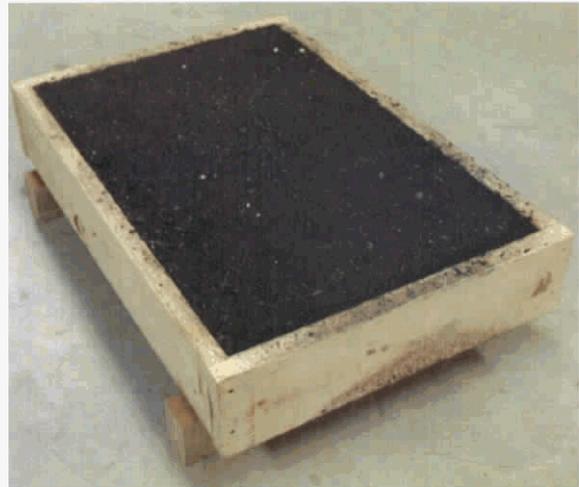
Specimen FPL-7 glulam deck panel with 76mm asphalt overlay. Side, forms are to conceal defect locations.
